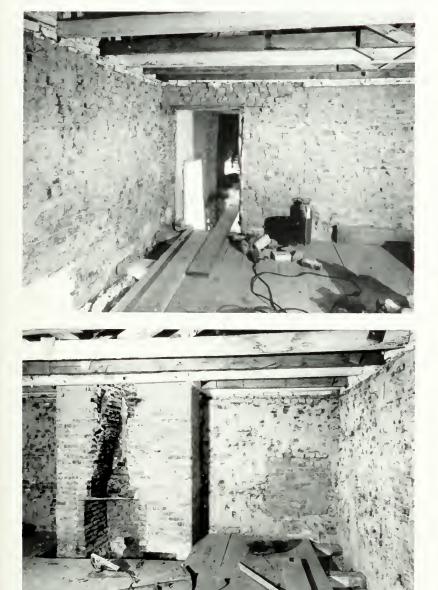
Looking west from east room upper-level into center room through the doorway, 1964 photo showing NPS removal of QMC upper-level floors in progress, and additional joists (those unpainted) inserted between the older joists.
